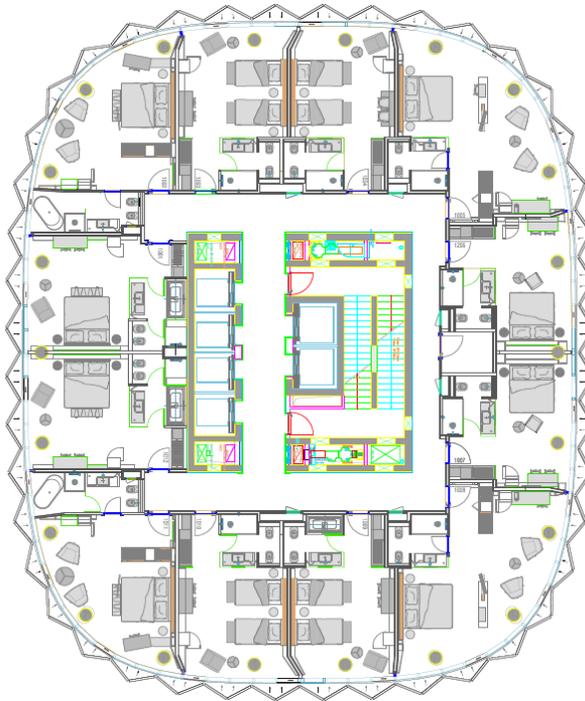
Guestroom floor layout typical floor plan (Floors 7-13)
